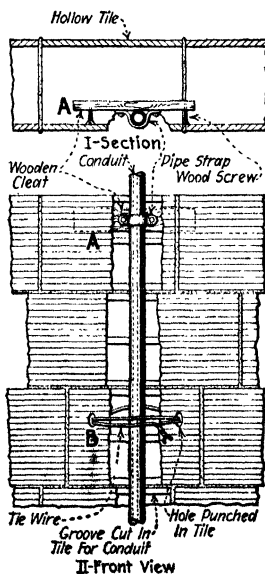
Supporting a vertical conduit run in a hollow tile surface.
